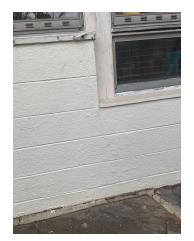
Repaired crack on west elevation; Fig. 4.2: Algae on south elevation retaining wall.
